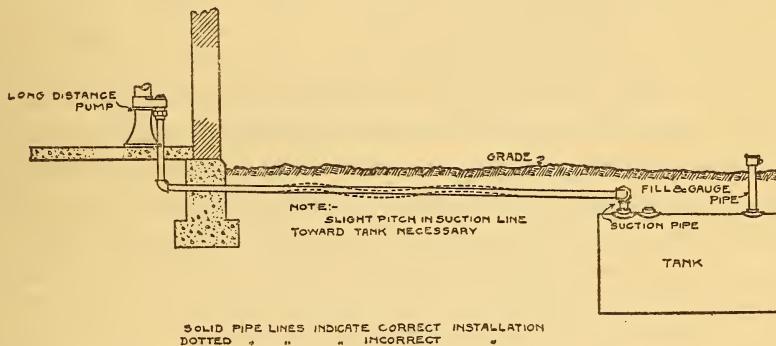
Illustrating correct and incorrect practice in installation of piping. Suction pipe should have a continuous, though not necessarily uniform, pitch from pump back to tank
